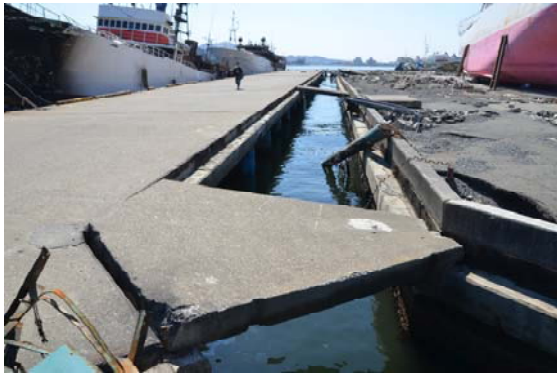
Damage to pier supported wharf in Kesen'numa
